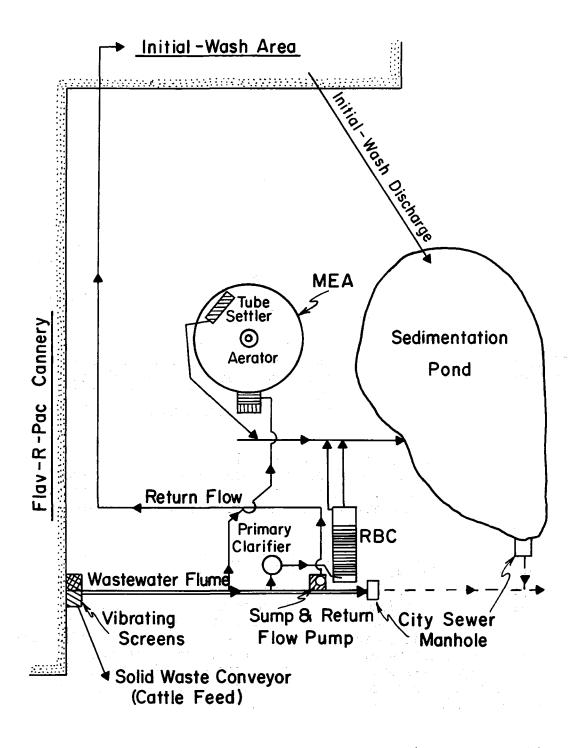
GENERAL PLAN VIEW OF CANNERY AND PILOT PLANTS
